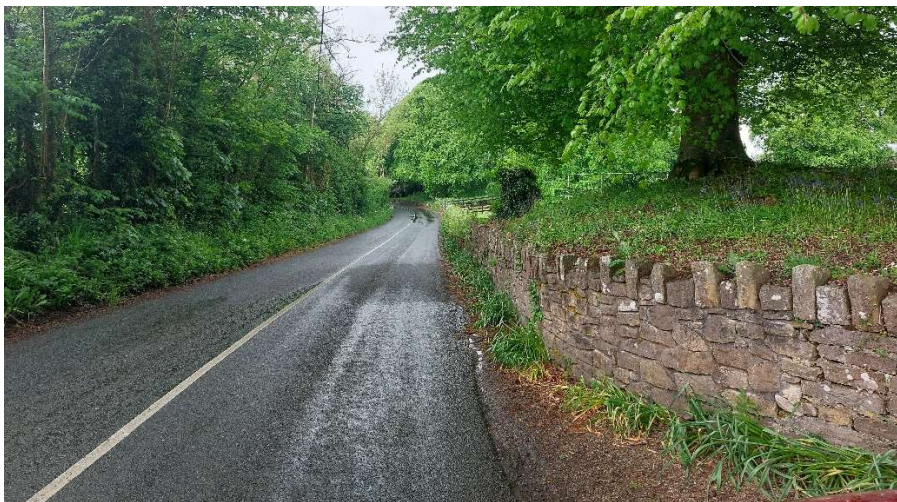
Western façade of Scarrough Bridge (BH5), facing northeast
